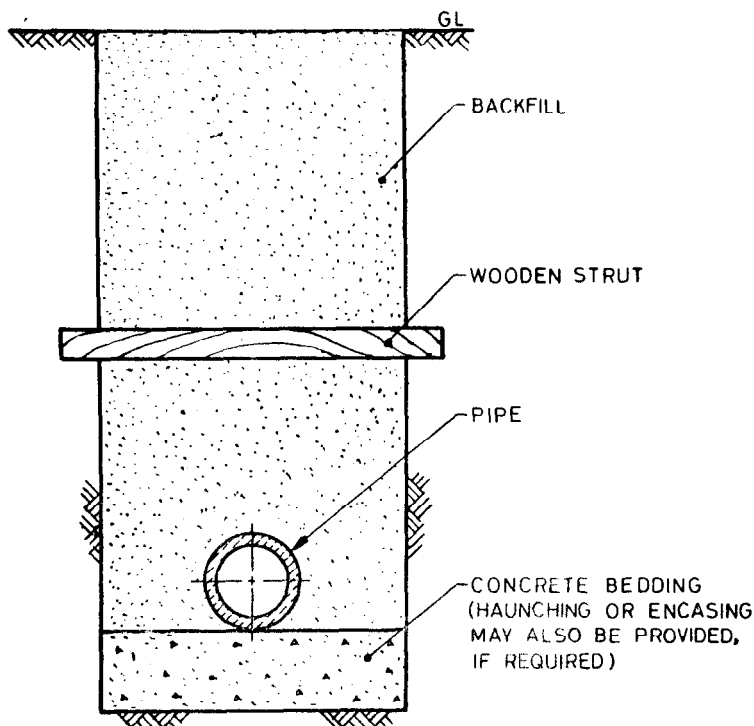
FIXING OF WOODEN STRUTS IN DEEP TRENCHES
